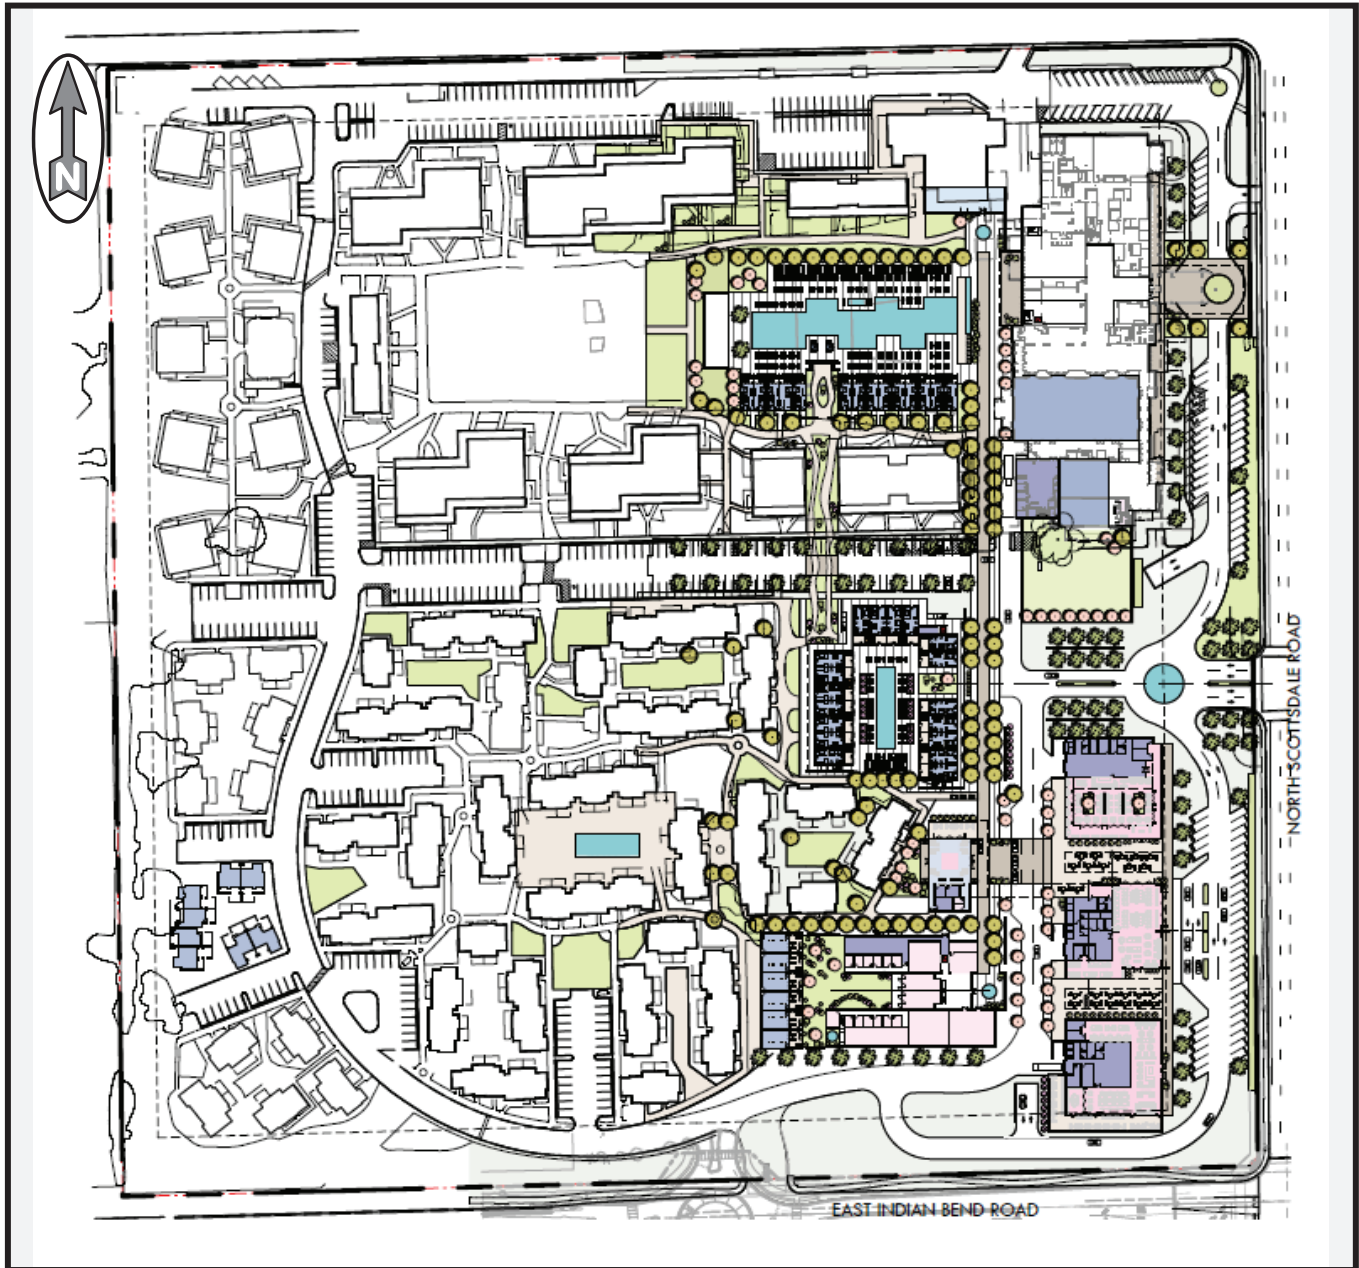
Renovated Scottsdale Plaza Resort Site Plan
